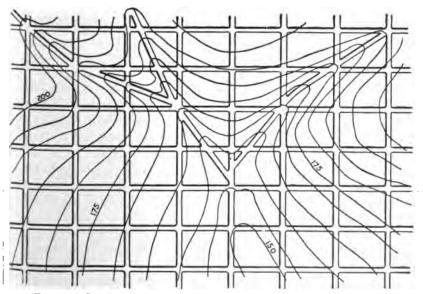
LAYOUT OF STREETS WITH REGARD TO TOPOGRAPHY.
